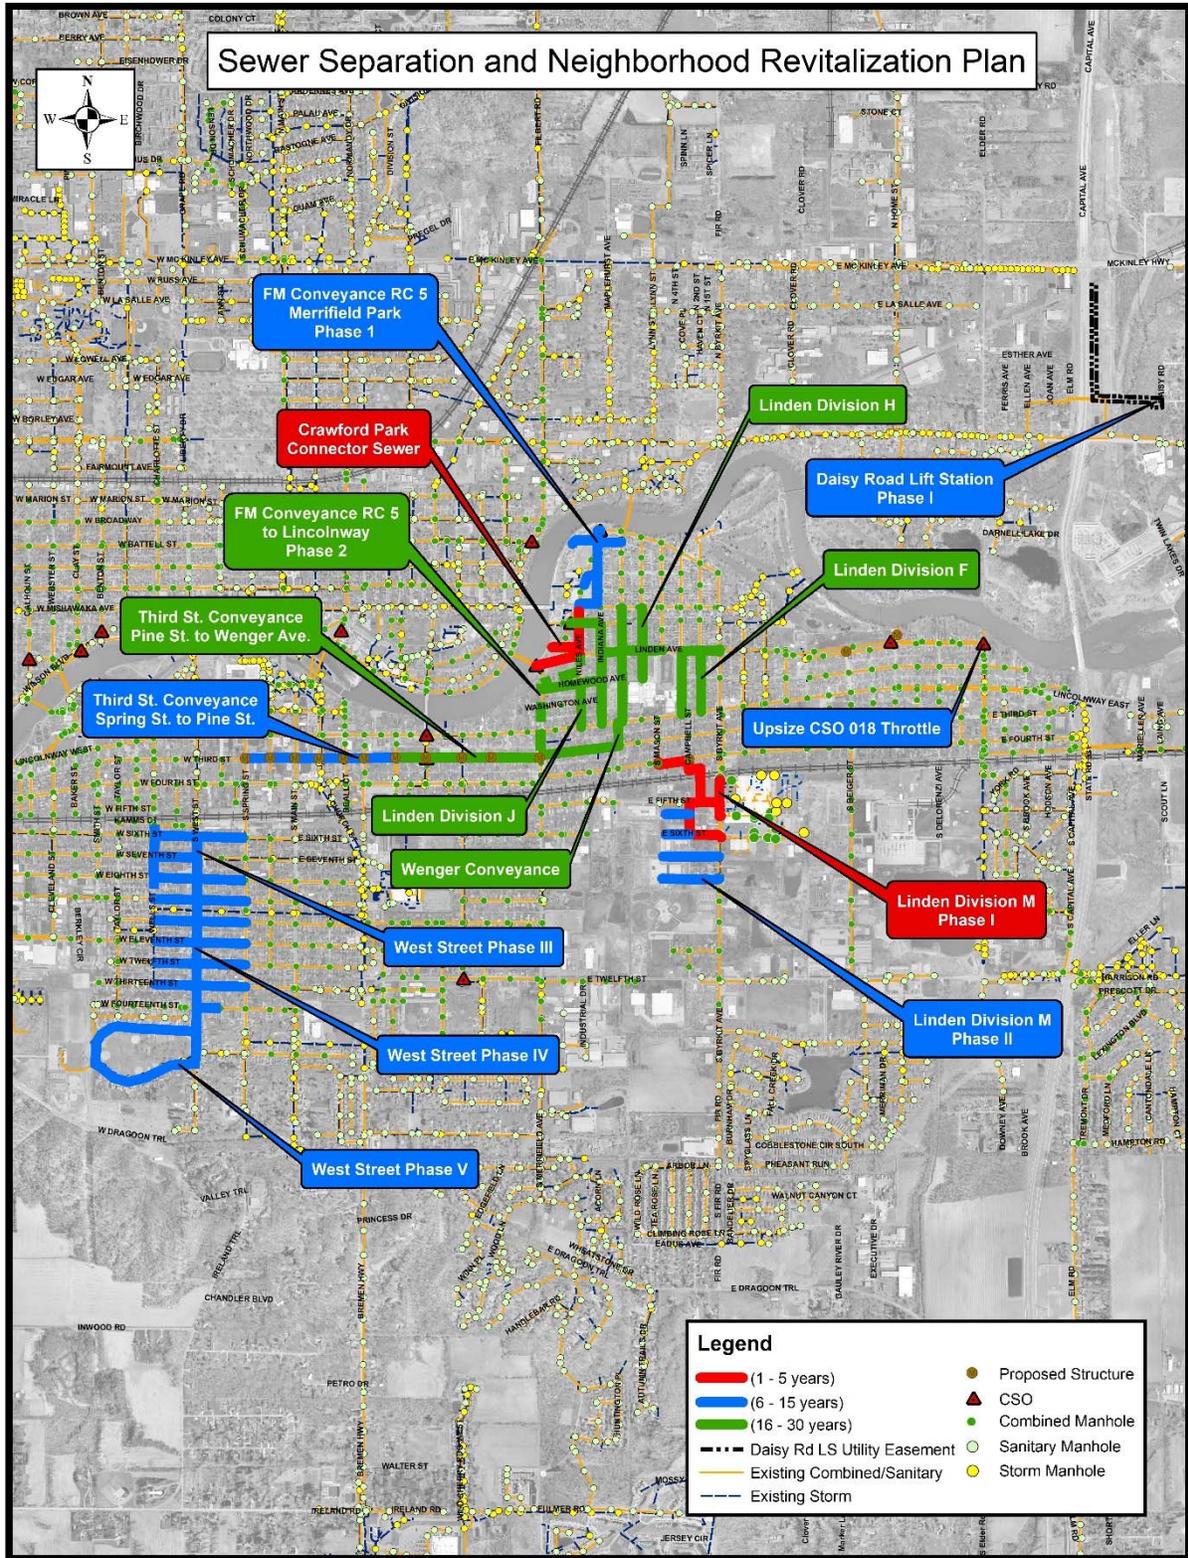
Exhibit A –Sewer Separation and Neighborhood Revitalization Plan
